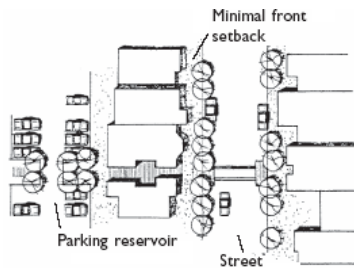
Buildings are placed at the perimeter of the block with parking behind
